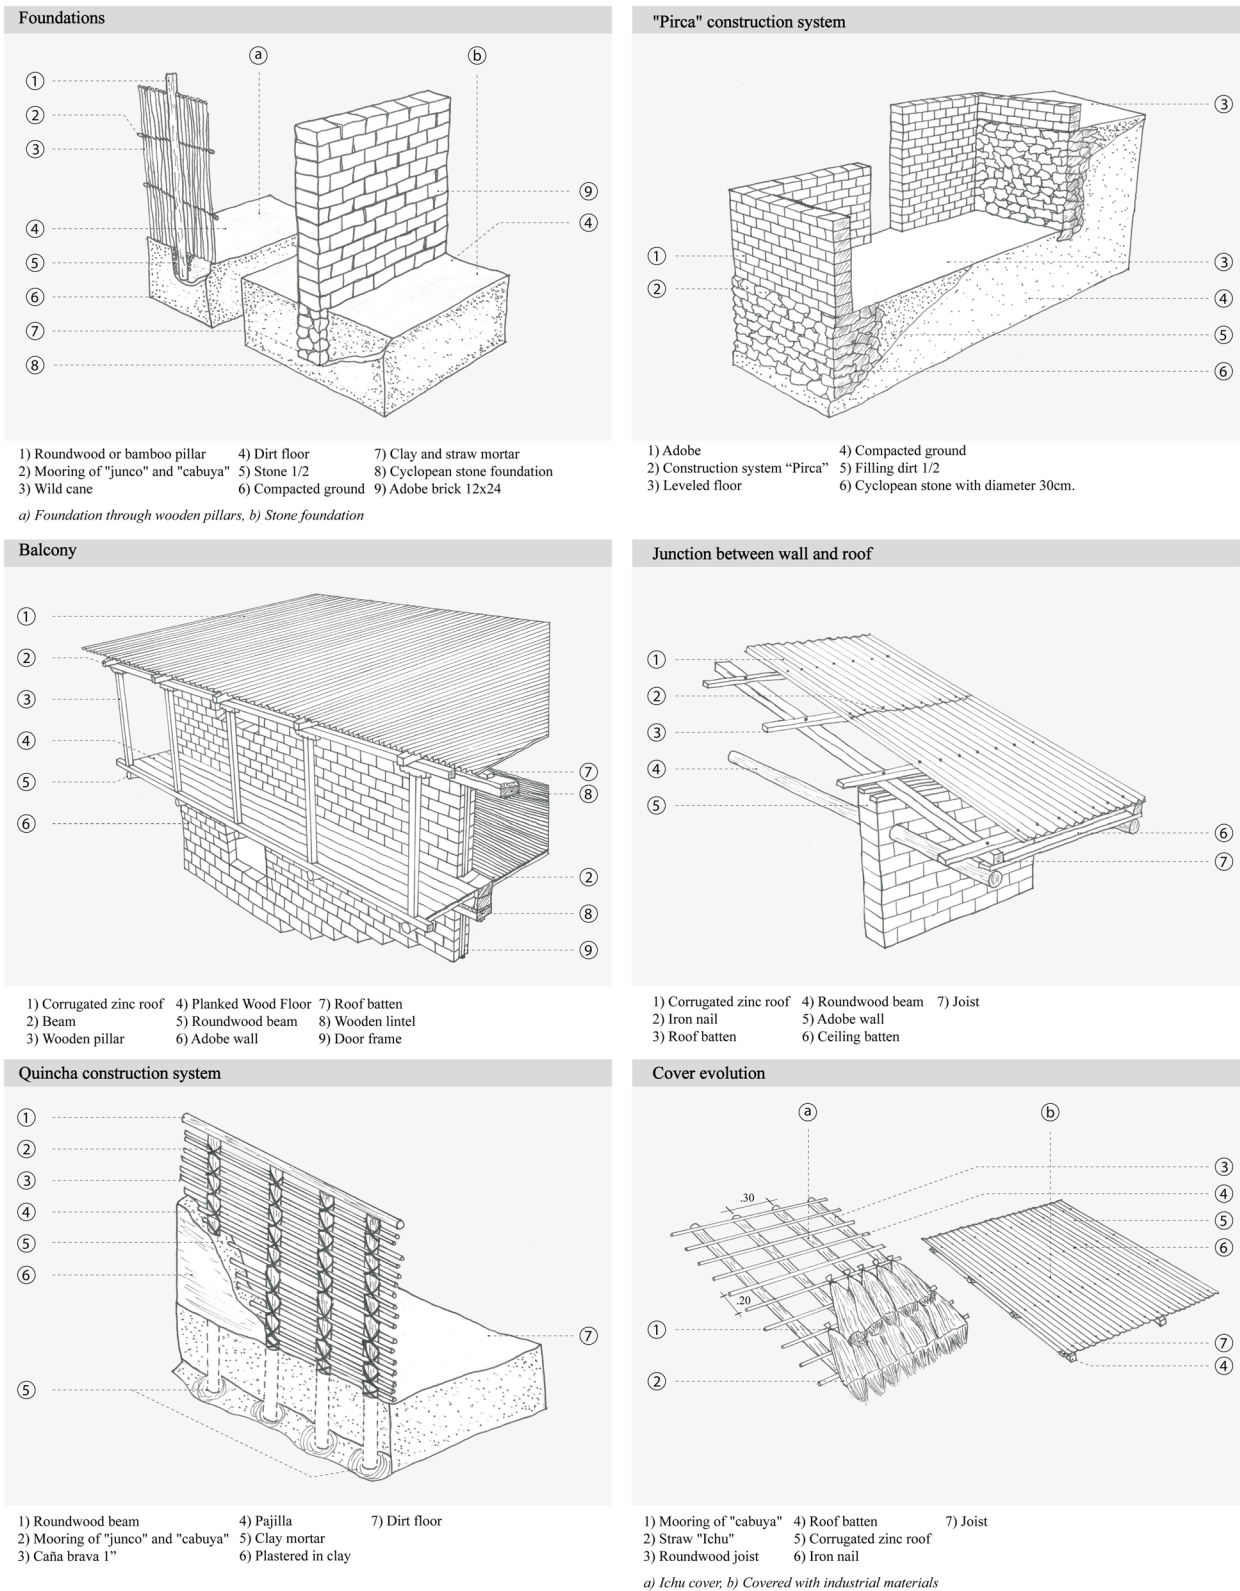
Construction details of rural housing in Jaén. (Source: the author)
